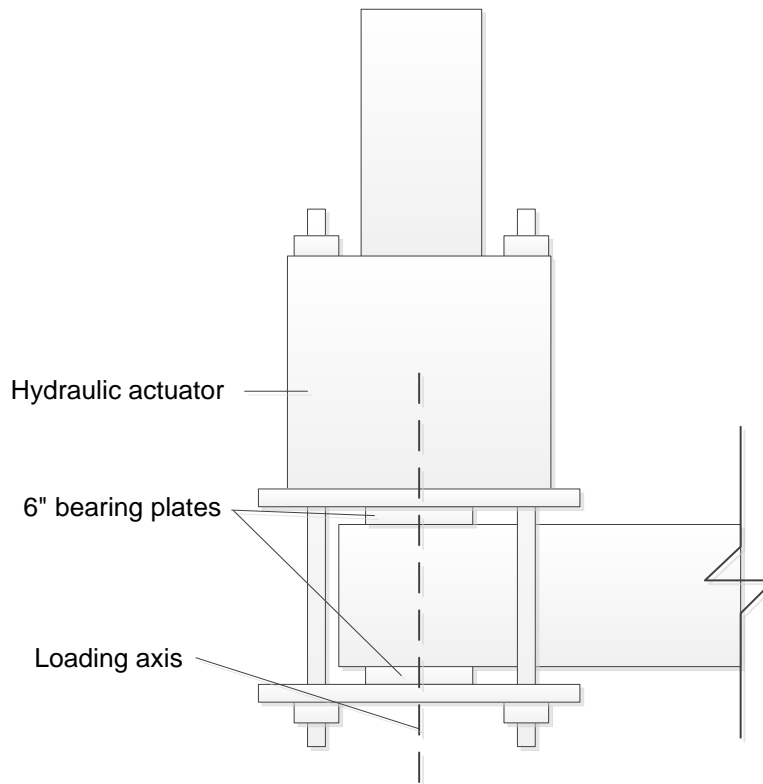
32 Cyclic load application mechanism on the cantilever specimen
